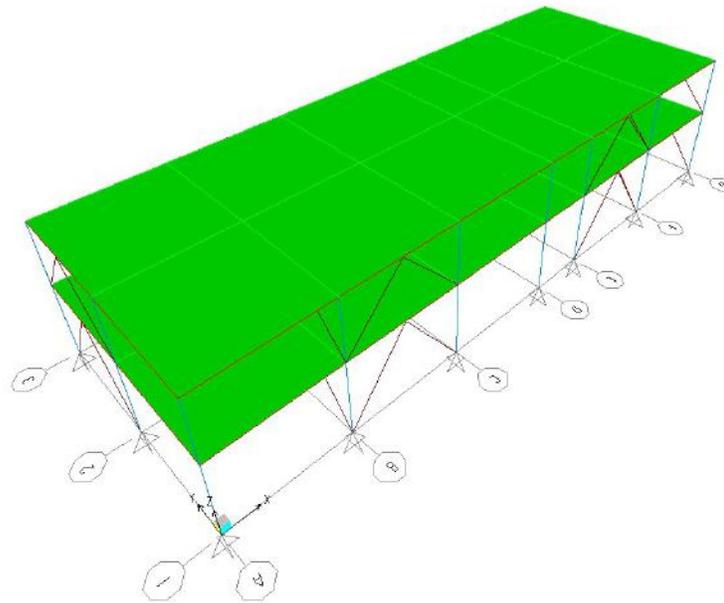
A 3-D numerical model of the retrofitted building with RC column jacketing and steel braces (RS2).
